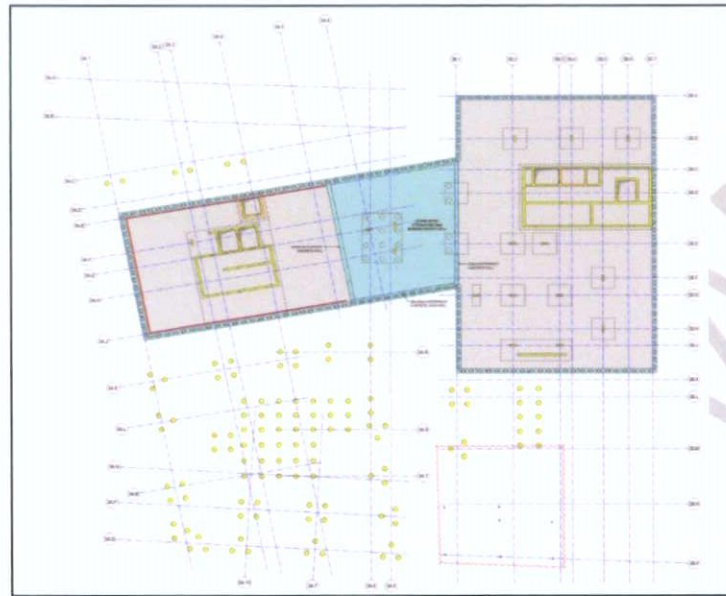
The proposed basement and pile foundation layout and attenuation tank (in blue).
